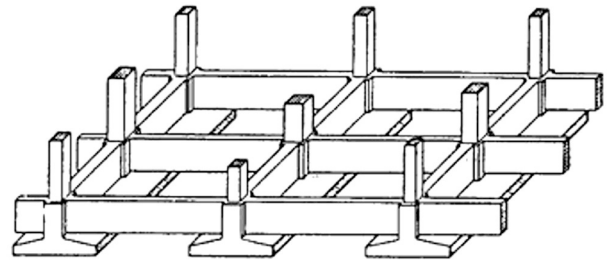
Spread footing in foundation plane (Geotecnia, 2019).
